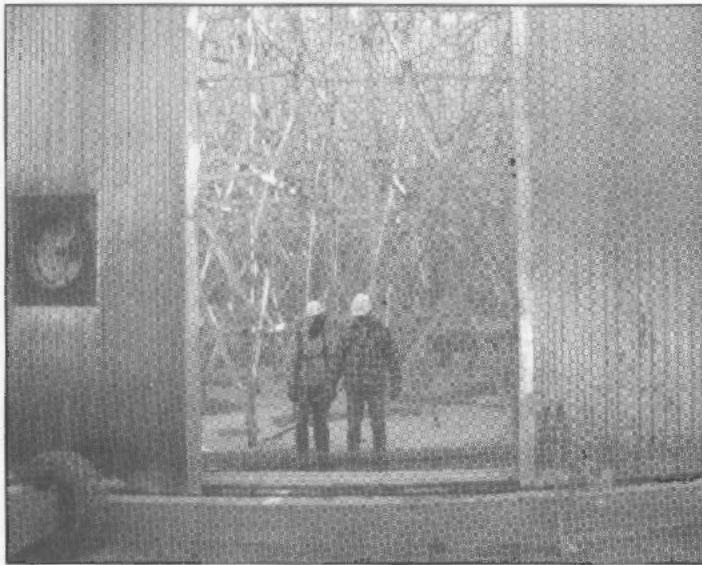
View Showing Steel Diaphragm on Outside of Wall Panels
